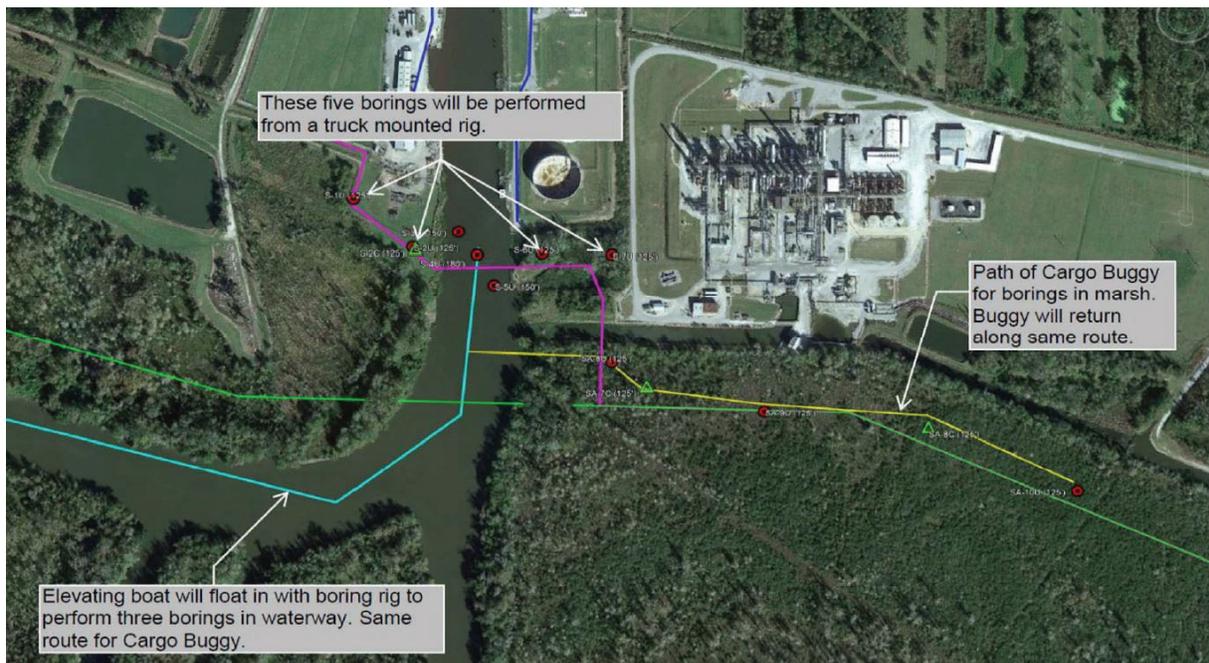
Overview of the Surveys and borings work zone for Shell Canal East Floodgate.
